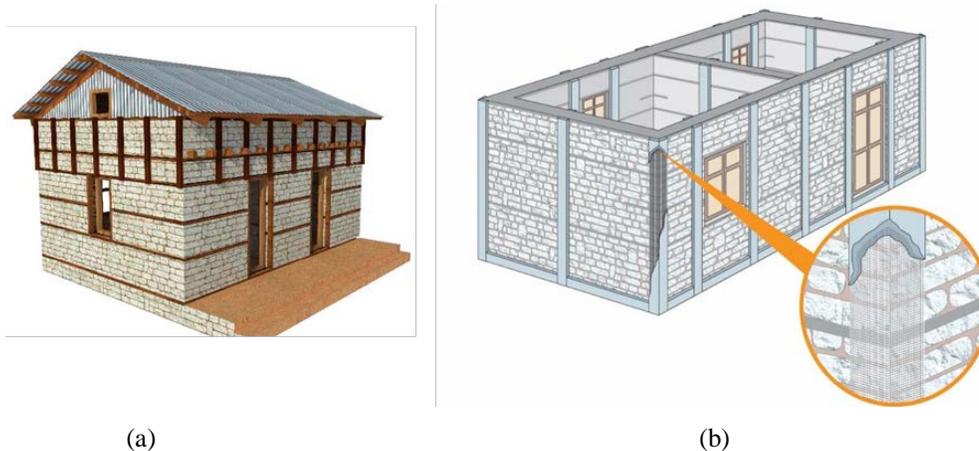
Vertical and horizontal reinforcement provisions for stone masonry houses: (a) using timber as the reinforcing elements (b) use of wire mesh as the reinforcement
